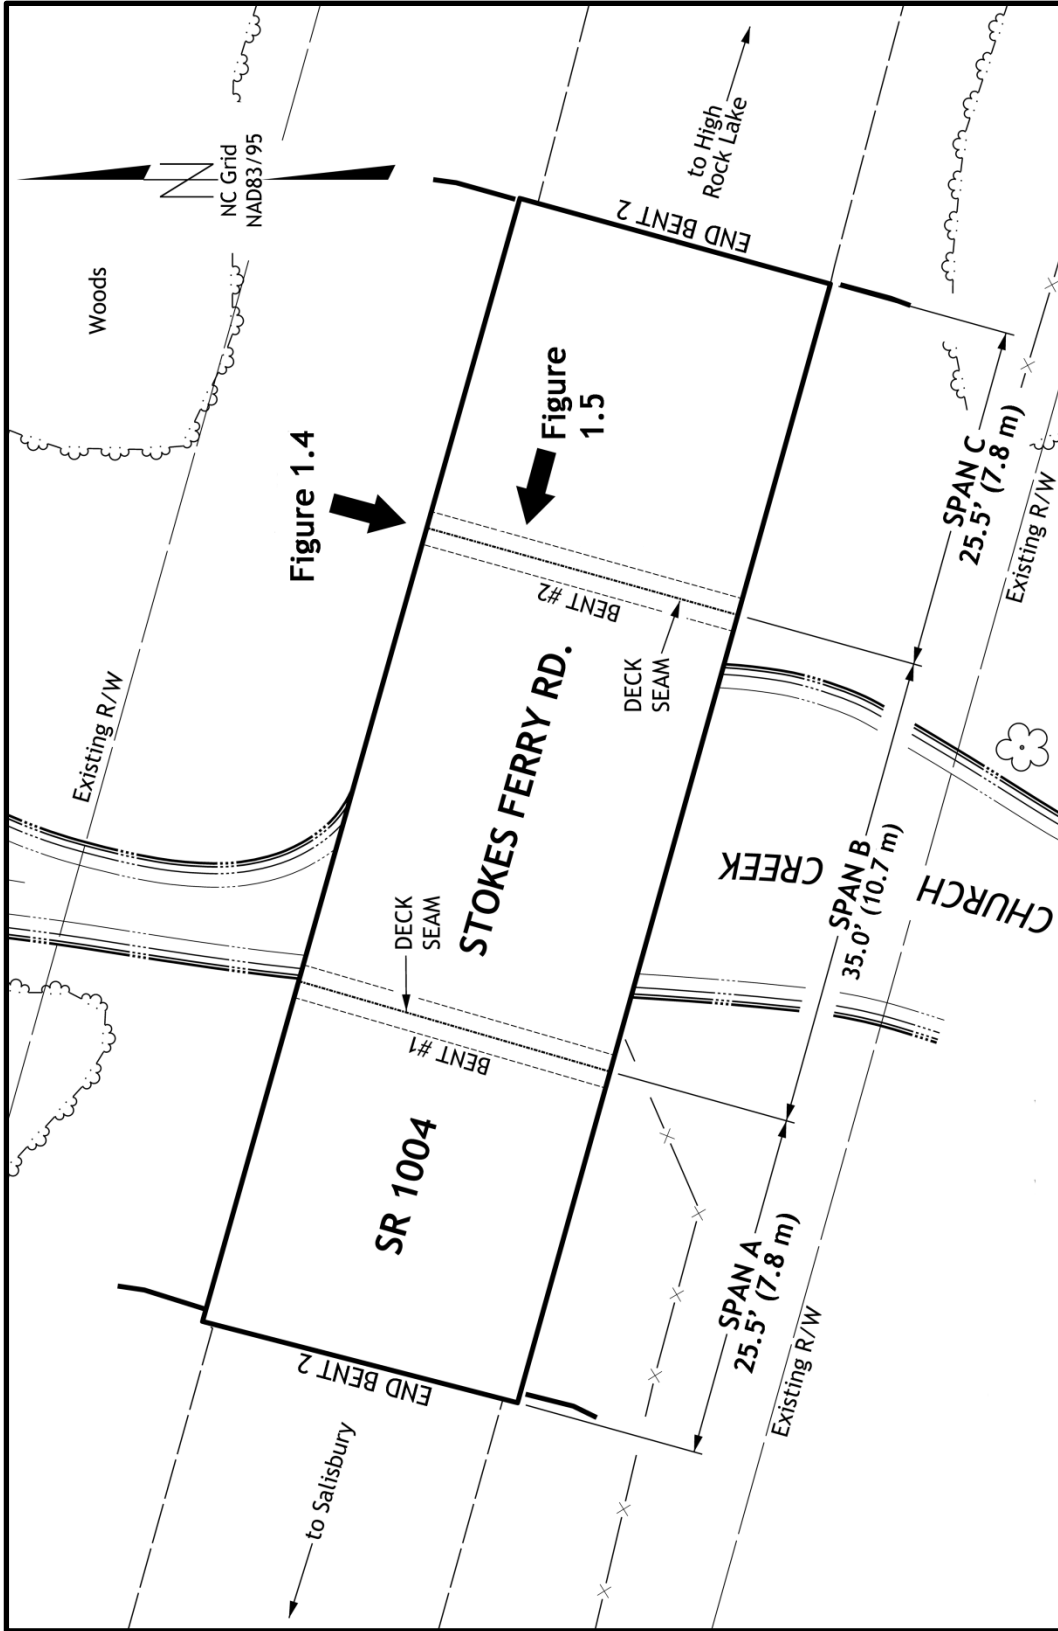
General arrangement of Church Creek Bridge. Figure not to scale.
